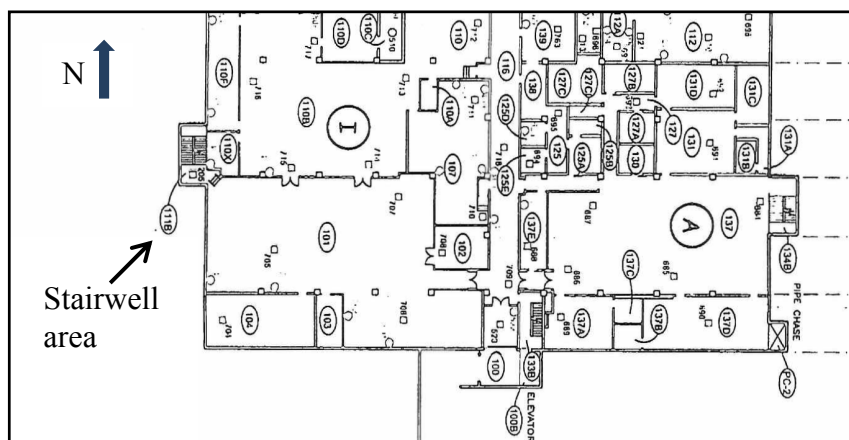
Stairwell shown on first floor layout drawing. Stairwell leads from second floor to basement level below first floor.
